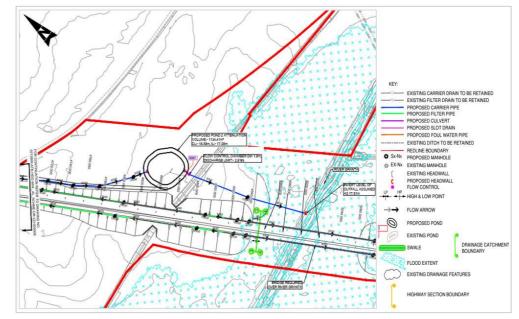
Proposed Pond 2 – layout and discharge location
